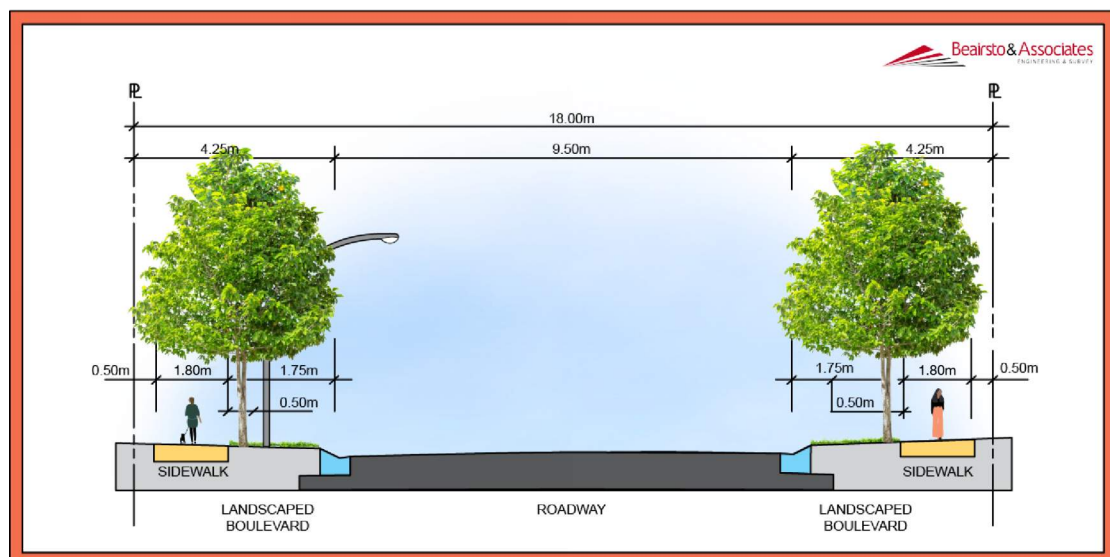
Residential Local Road (Rear Lane Access) Cross Section
